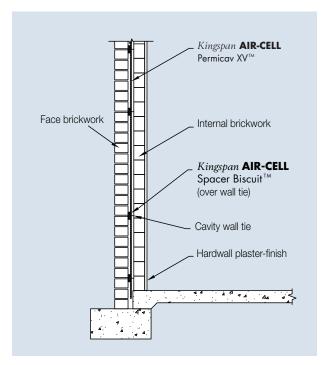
Side elevation of Kingspan AIR-CELL Permicav XV^{TM} in double brick cavity wall
